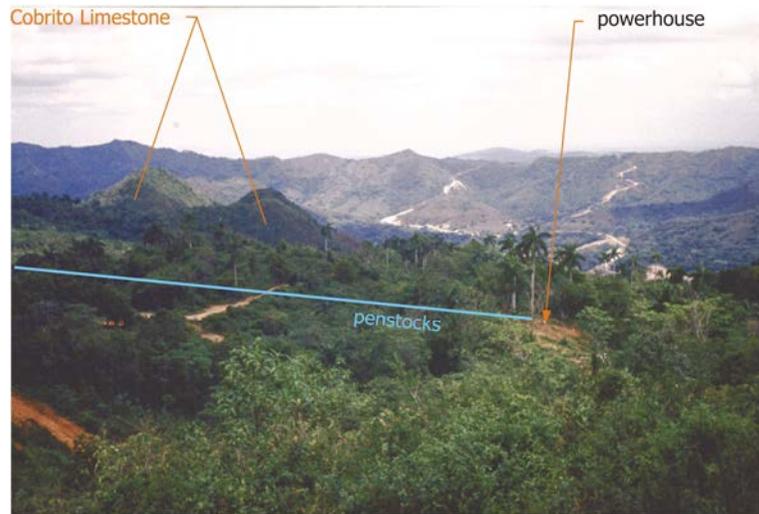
General view across the area of the Centro Cuba PSHEP showing the location of the planned penstock and power house (a photo by O. Horský - 1985)
